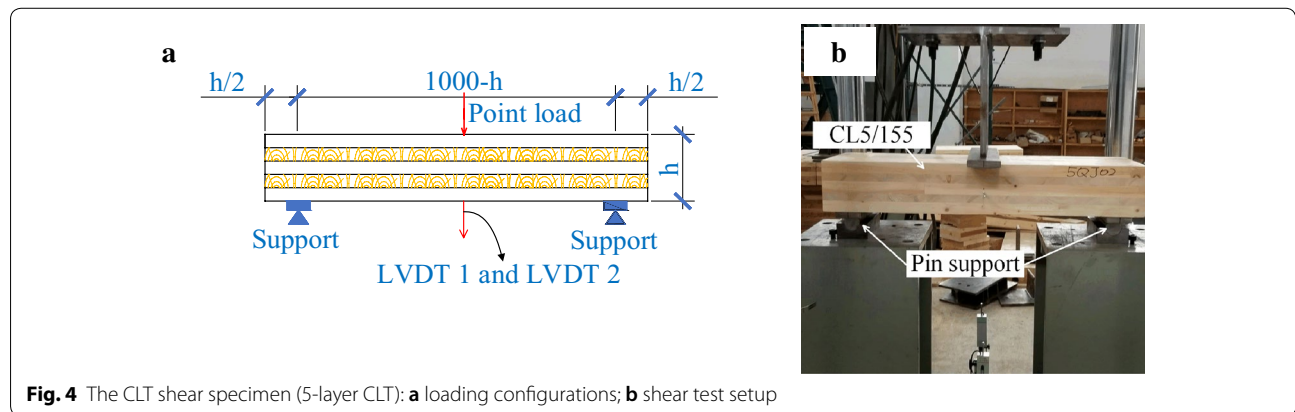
The CLT shear specimen (5-layer CLT): a loading configurations; b shear test setup
